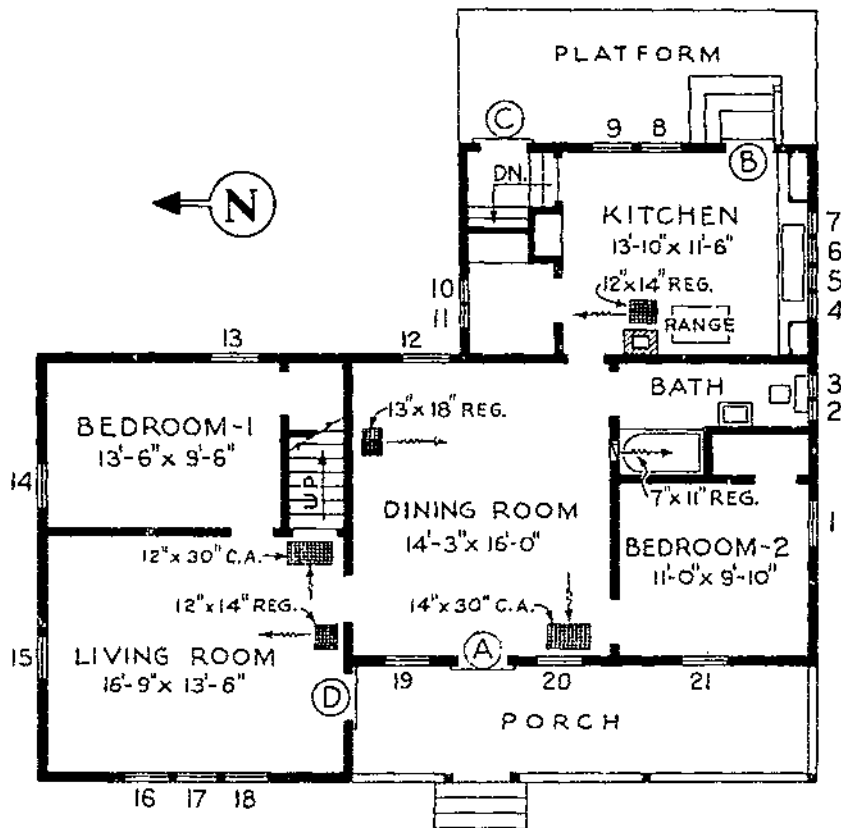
First floor plan of house No. 2, showing location of warm-air registers and cold air returns.
